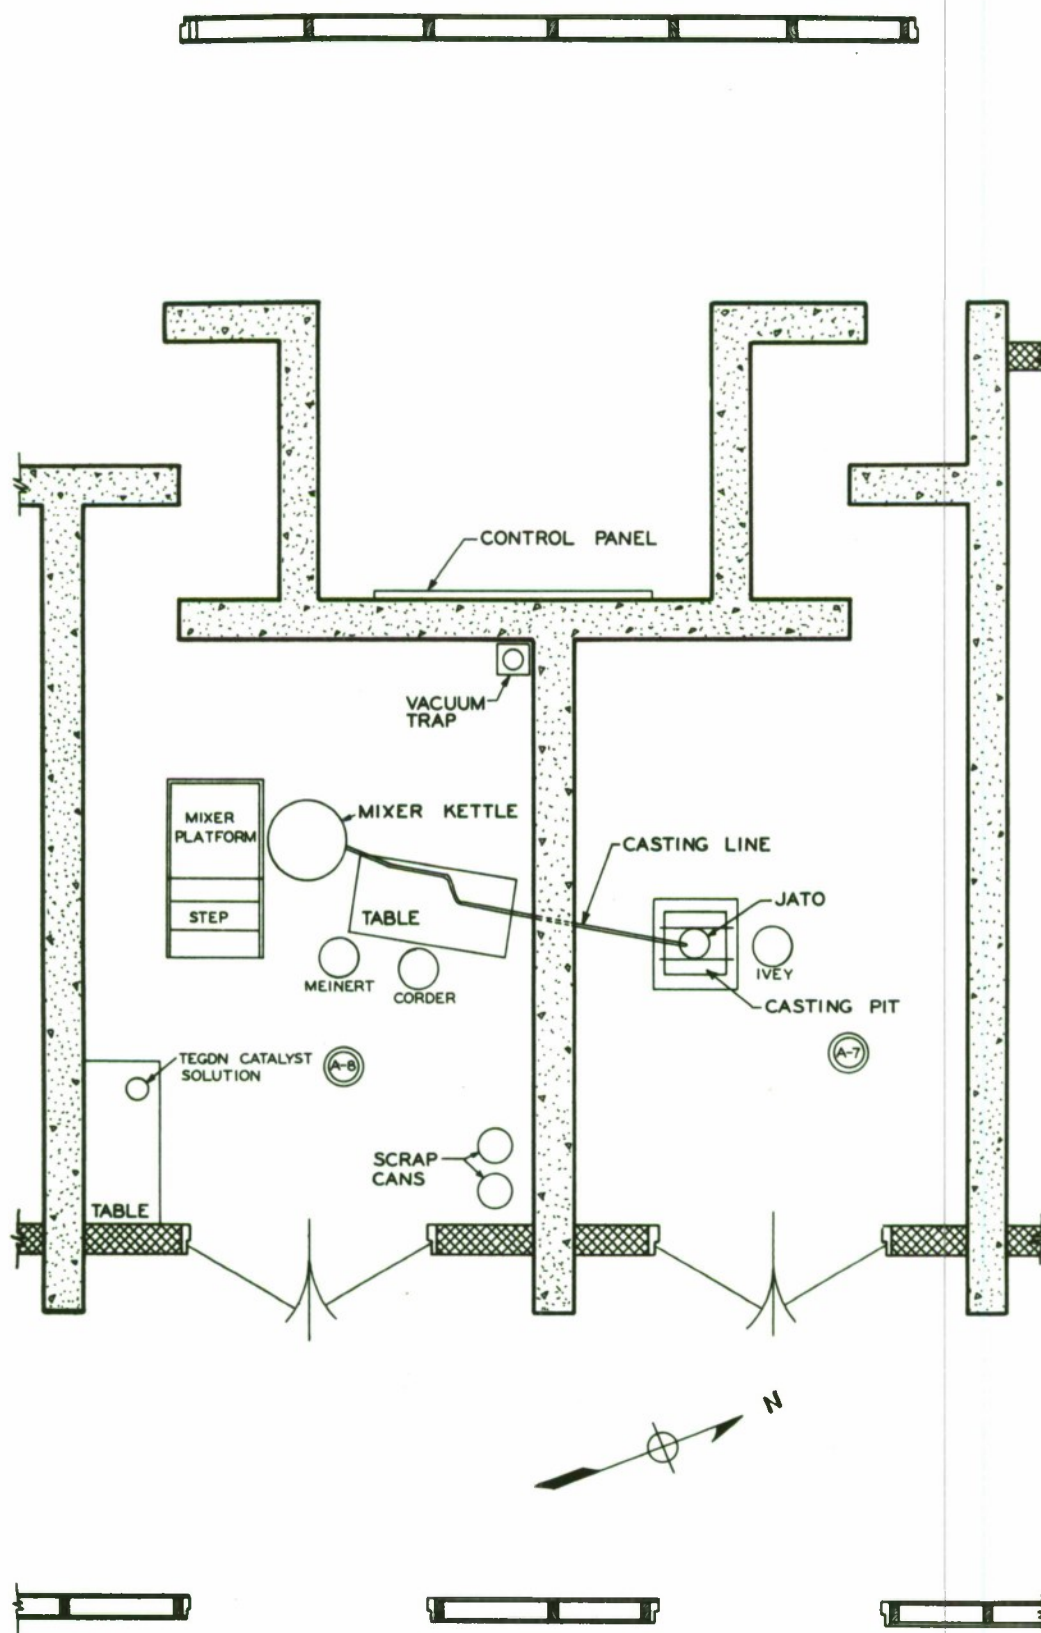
Floor plan of bays A-7 and A-8 in Bldg. 7595.
